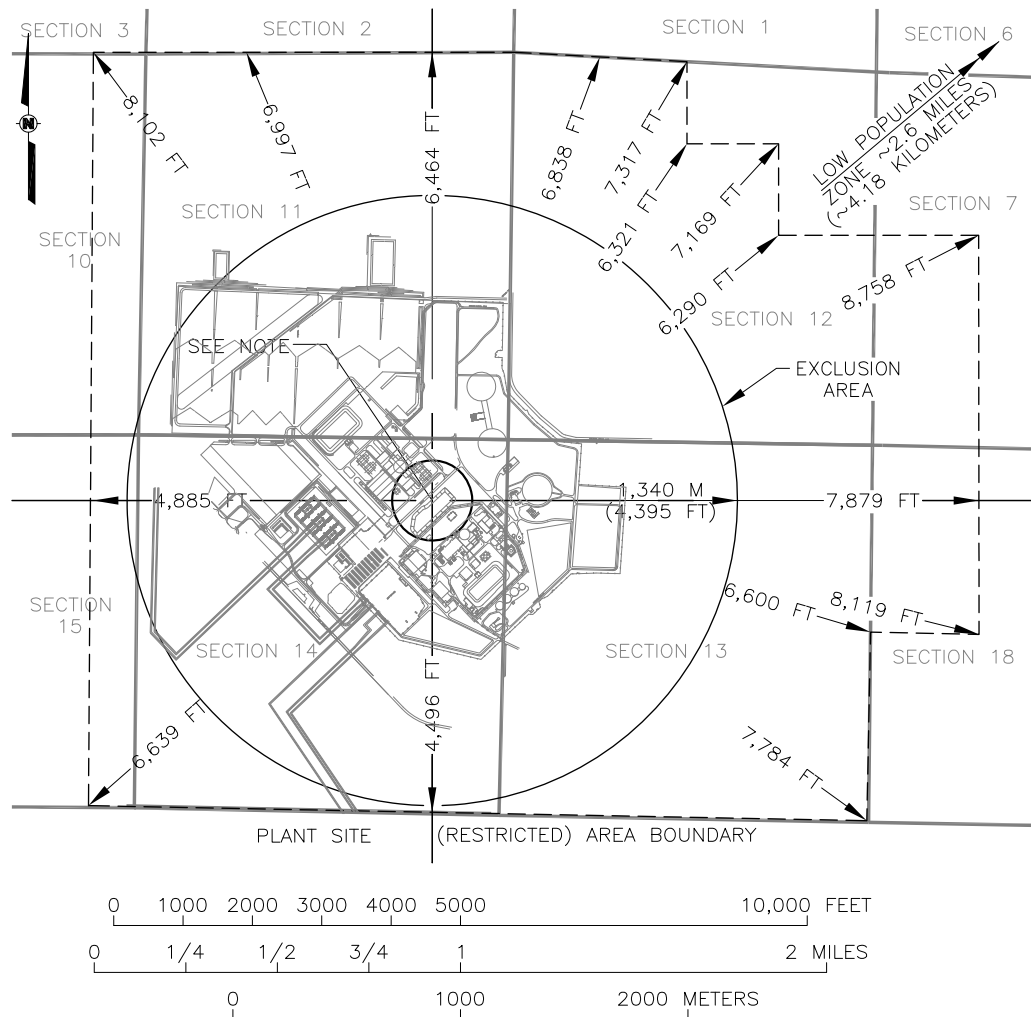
{Callaway Plant Unit 2 Enlargement}CALLAWAY PLANT UNIT 2 PLANT FACILITIES
